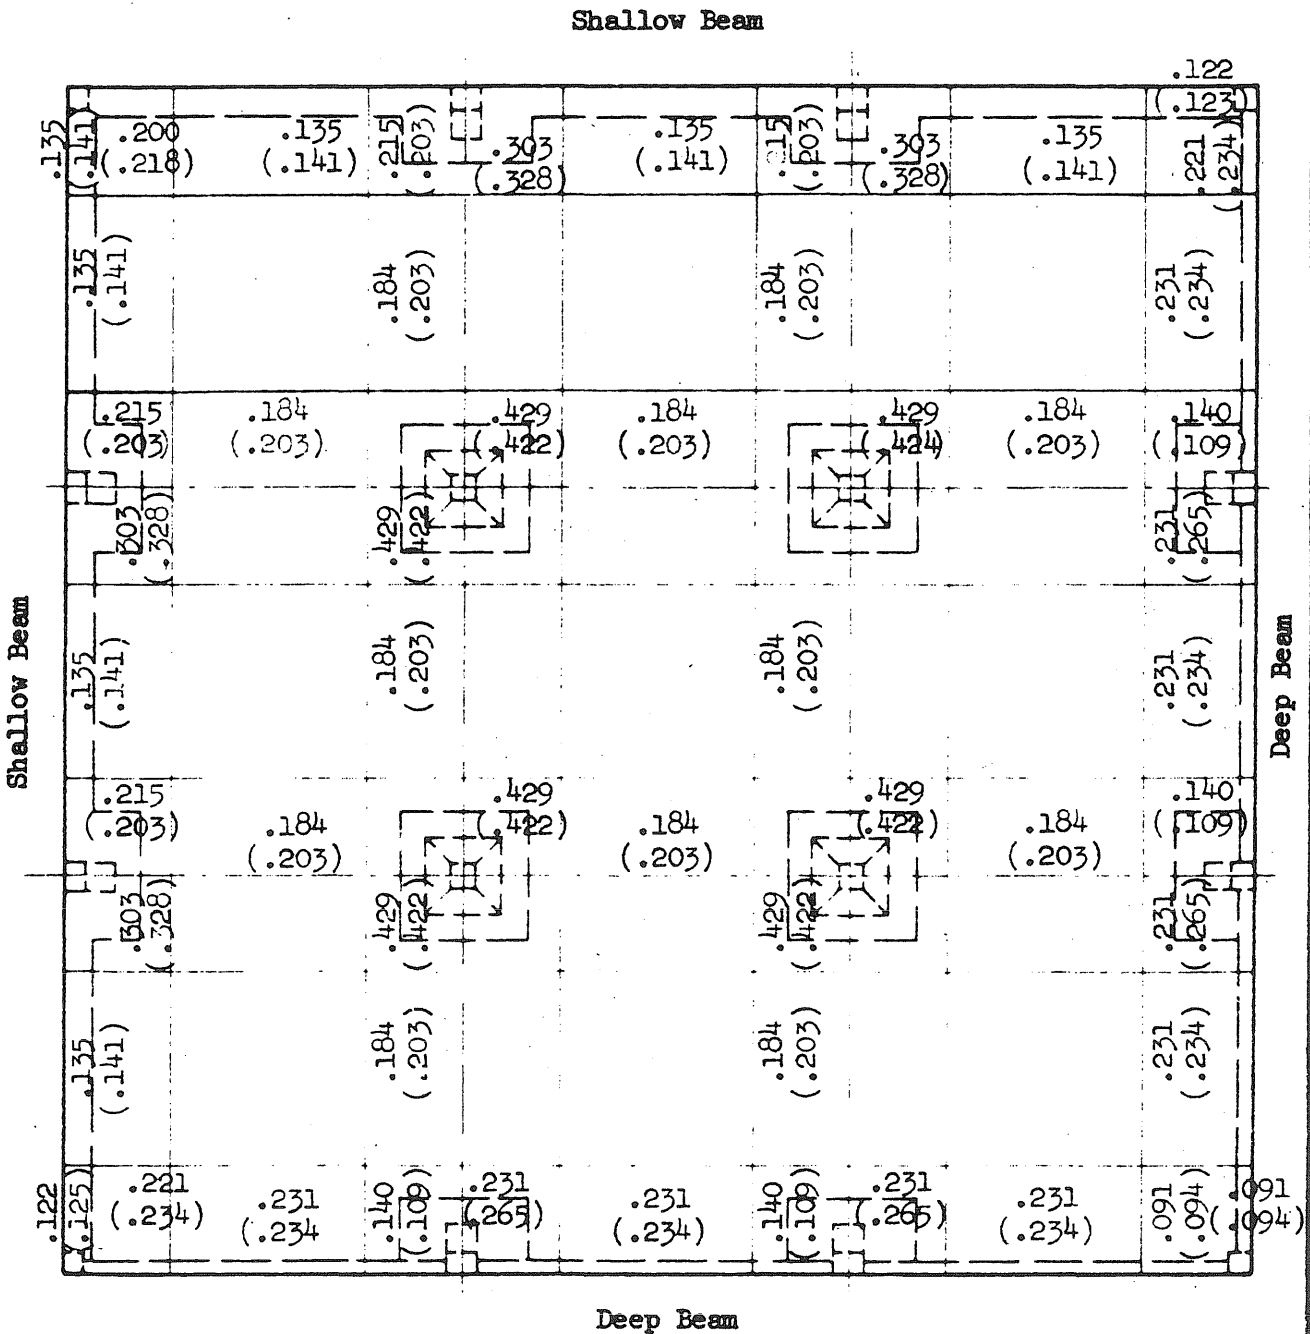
COMPARISON OF CROSS-SECTIONAL AREAS OF SLAB NEGATIVE REINFORCEMENT PROVIDED IN TEST STRUCTURES NO. 2 AND NO. 5
